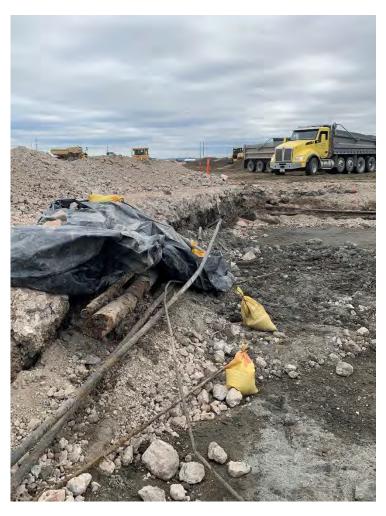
Open excavation prior to dewatering on 8/10/2020, view looking northeast.
